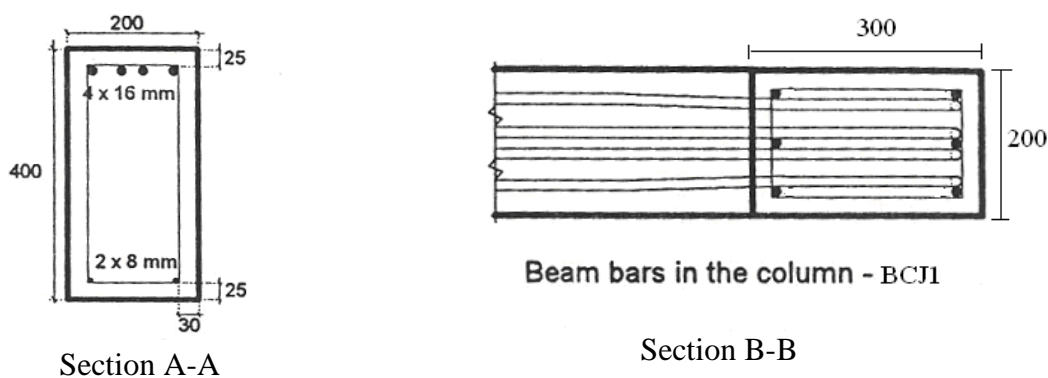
Reinforcement in the cross sections for beams and column for BCJ-1.
